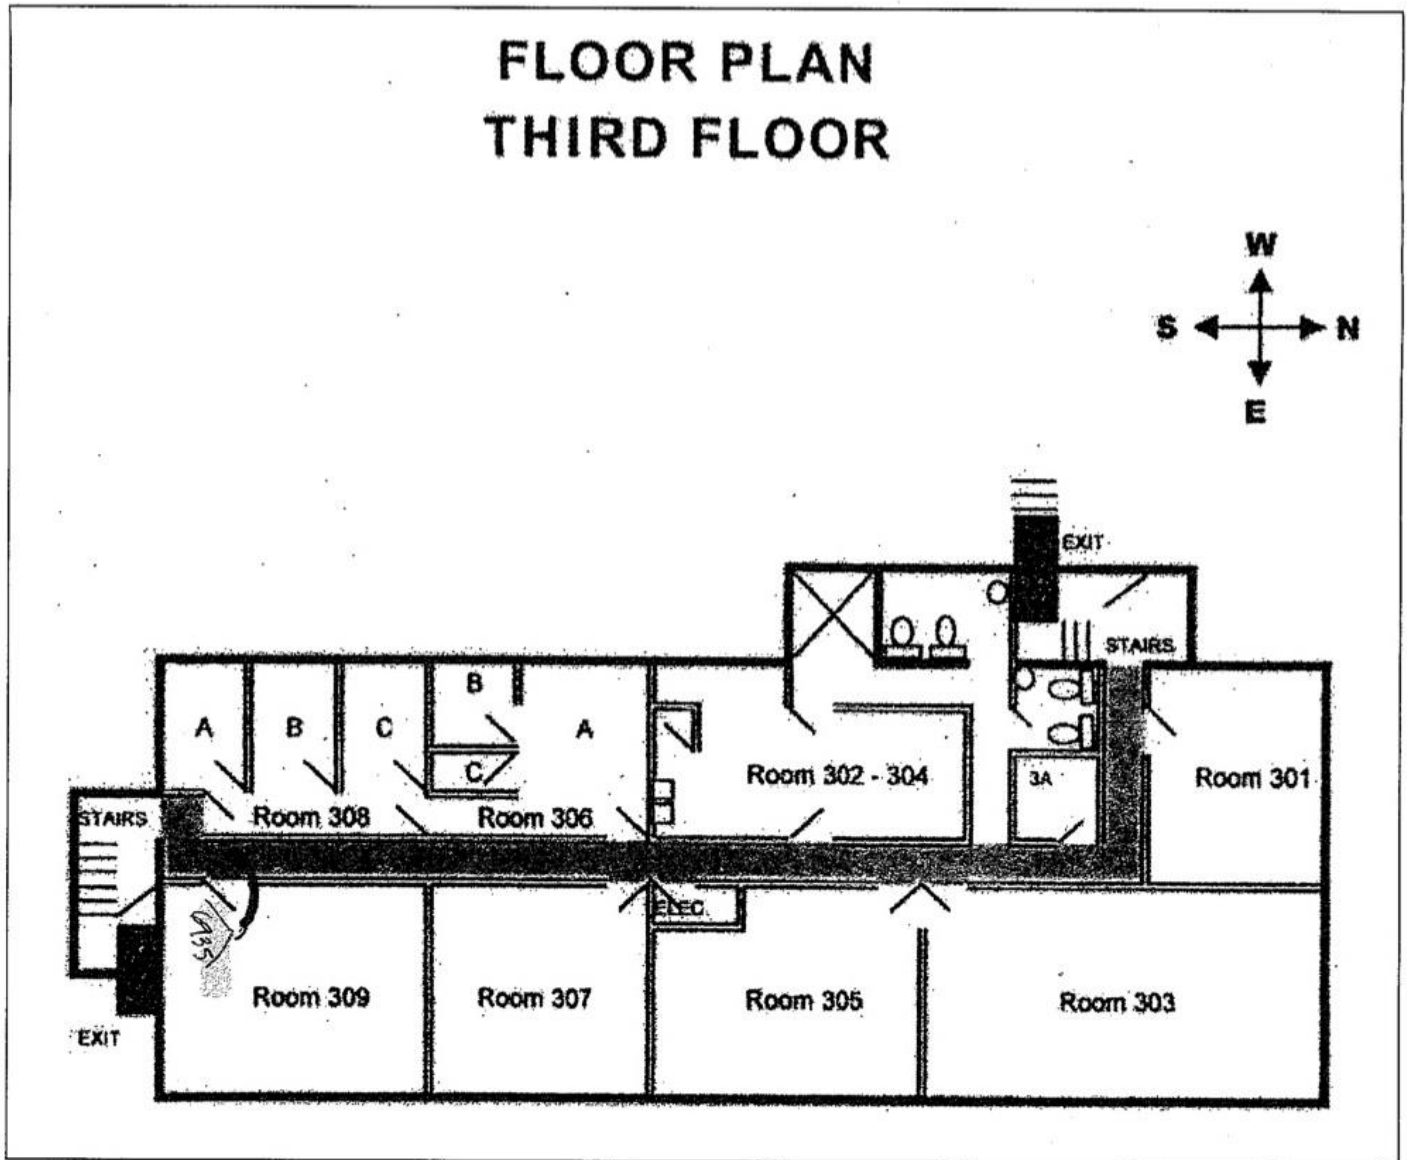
Floor Plan, Third Floor – City of Eau Claire, 2010.
